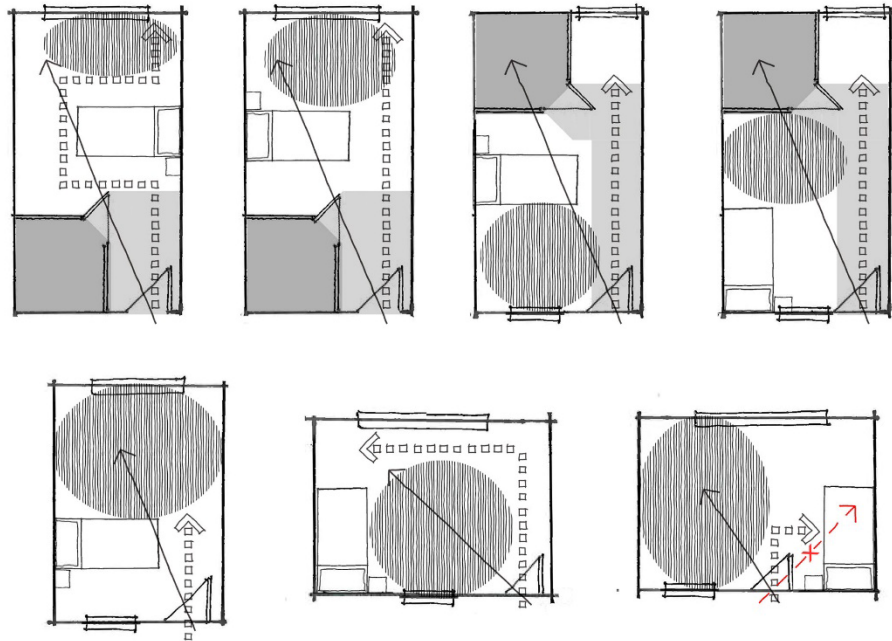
Difficulties with accessing hobbies were highlighted in rooms accessed from the narrow edge, and with access past en-suite bathrooms. Additionally, the rigidity of furniture and circulation layouts in bedrooms is a potential barrier to alternative fulfilling uses.
